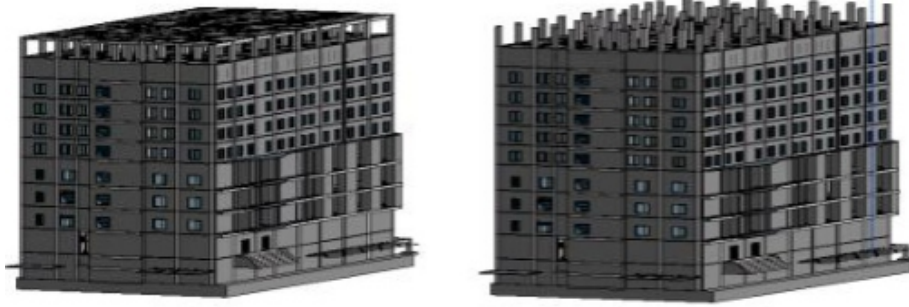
10th floor level beam Figure 36: 11th floor level and slab, 8th FL wall and floor and column and 10th floor level stair and 7th FL D & W for phase 25 shear wall, 9th floor level wall and floor and stair and 8th FL doors and windows for phase 26
